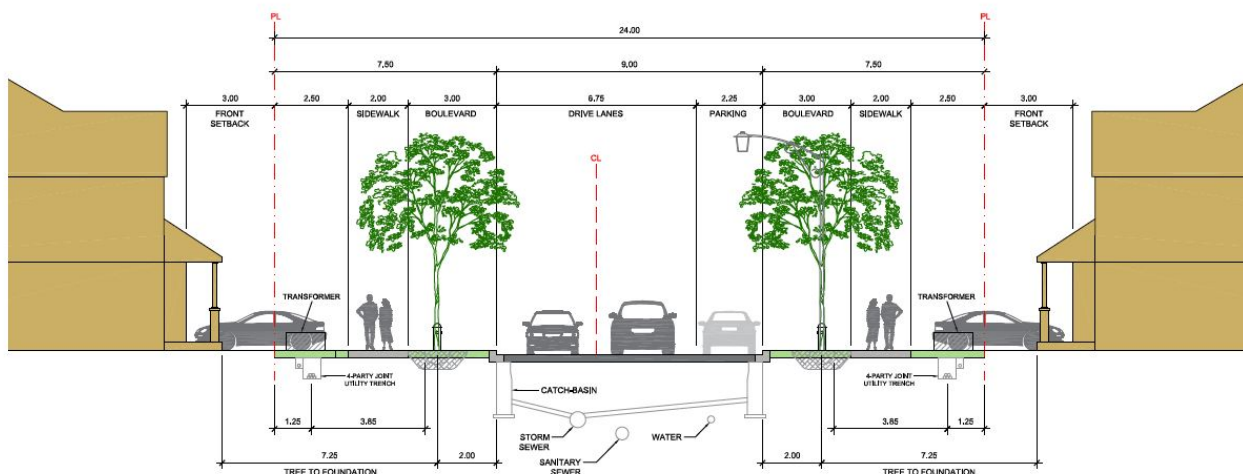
Typical Cross - Section of Collector Street (24 metres)
